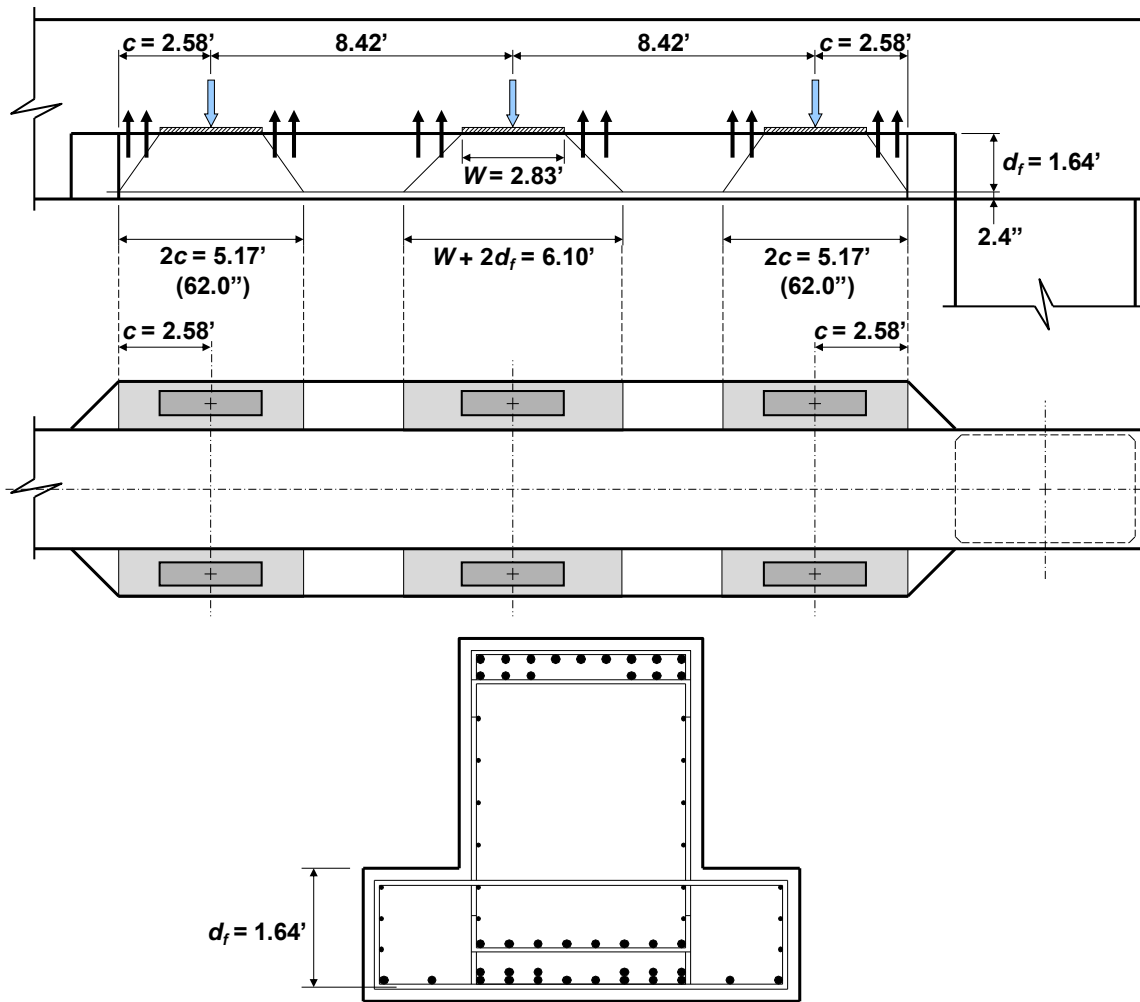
Available lengths for hanger reinforcement – plan and elevation views
